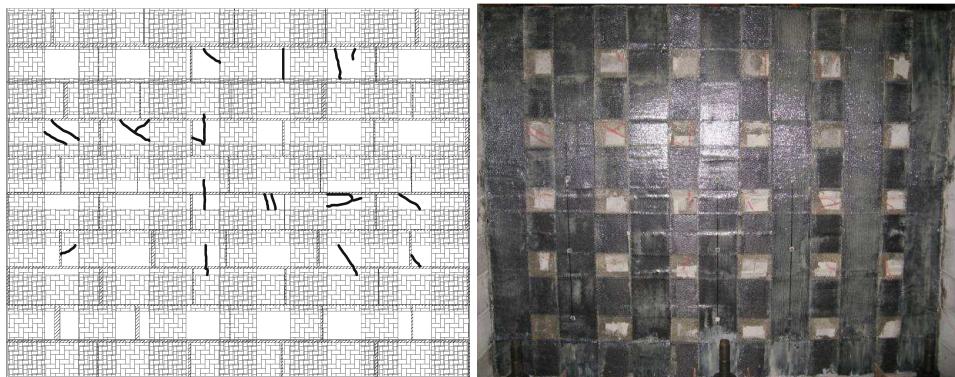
Wall 3- Failure mode of the principal wall (0.01mm average thickness of the cracks)
